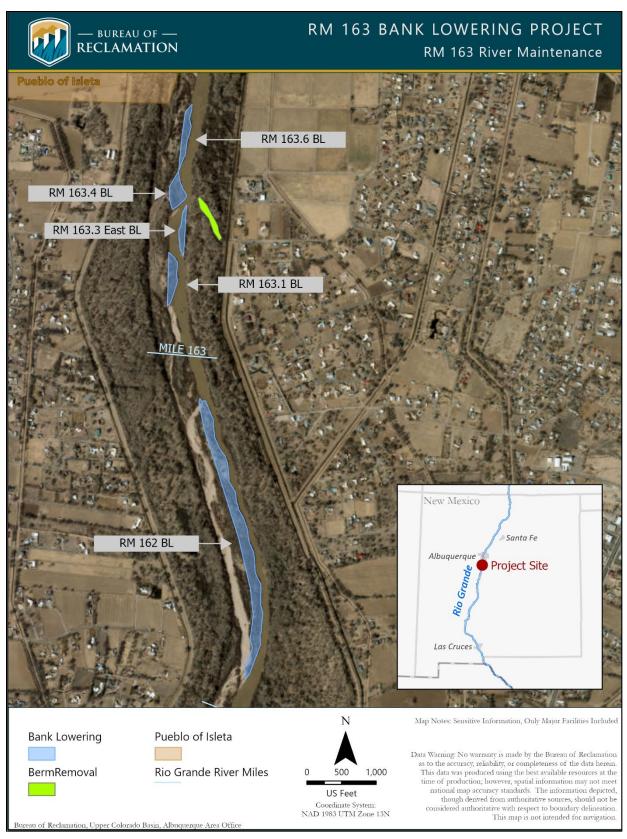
Plan view showing the design bank lowering (BL) berm removal features of the RM 163 maintenance project immediately upstream of U.S. Highway 6 bridge
